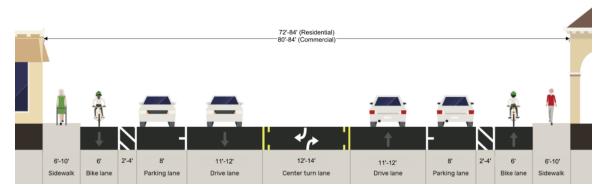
Proposed Typical Section for Secondary Arterial (Buffered Bike Lanes and Parking)
